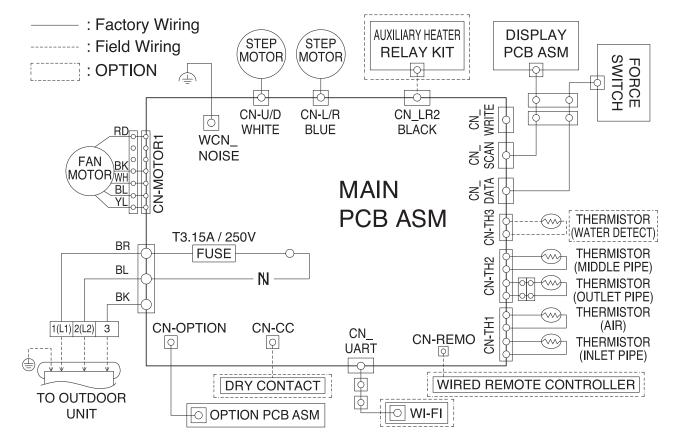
Multi F Standard Wall-Mounted LMN248HVT Indoor Unit Wiring Diagram.
